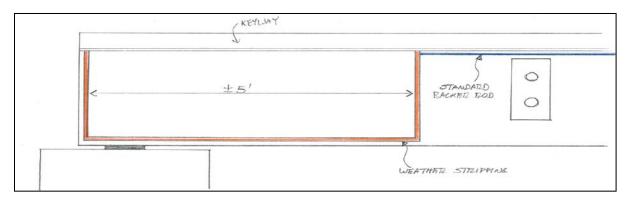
Full Depth Grouting Procedure to Prevent Beam Rollup
